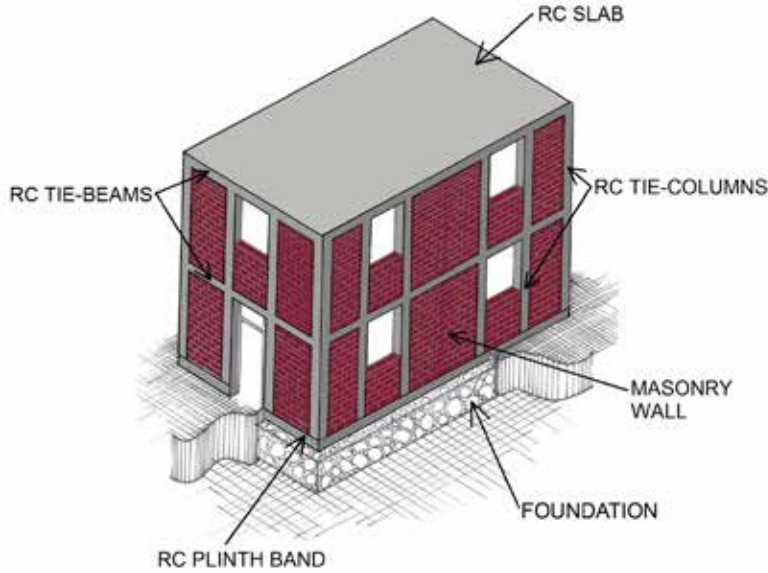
Key components of a confined masonry building (Brzev, 2008).
